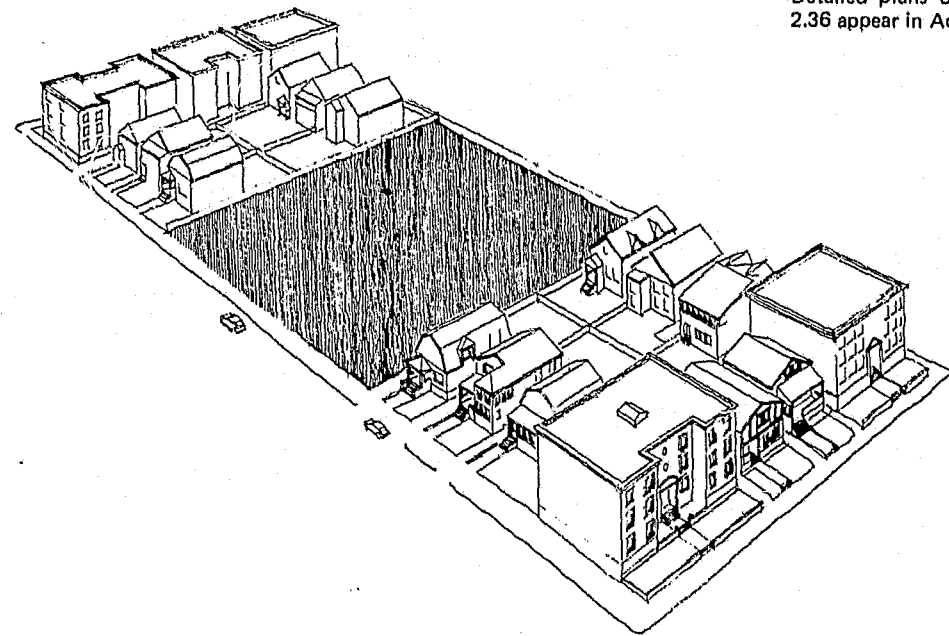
Typical city block, 200' X 600' showing a one-acre (218' X 200') vacant site in the center. Figures 2.25 through 2.36 show how the site could be developed in densities ranging from six to 103 dwelling units to the acre.
